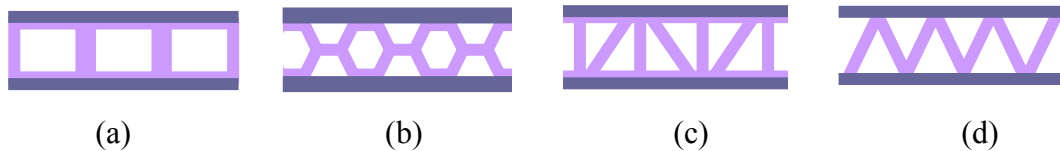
Typical cross-sections of FRP decks from pultruded components.
